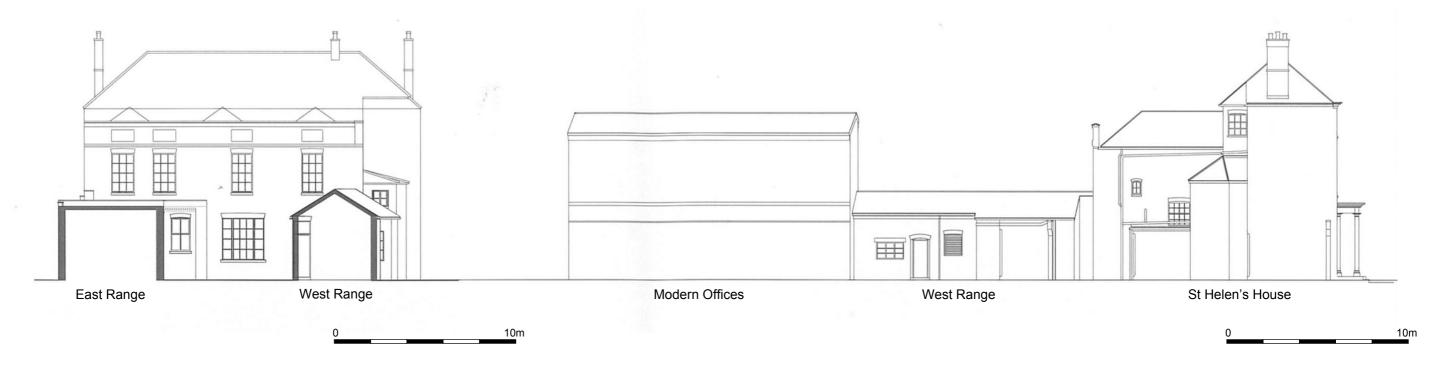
The north elevation of St. Helen's House based on drawings provided by the client. Scale 1:200 at A3.
